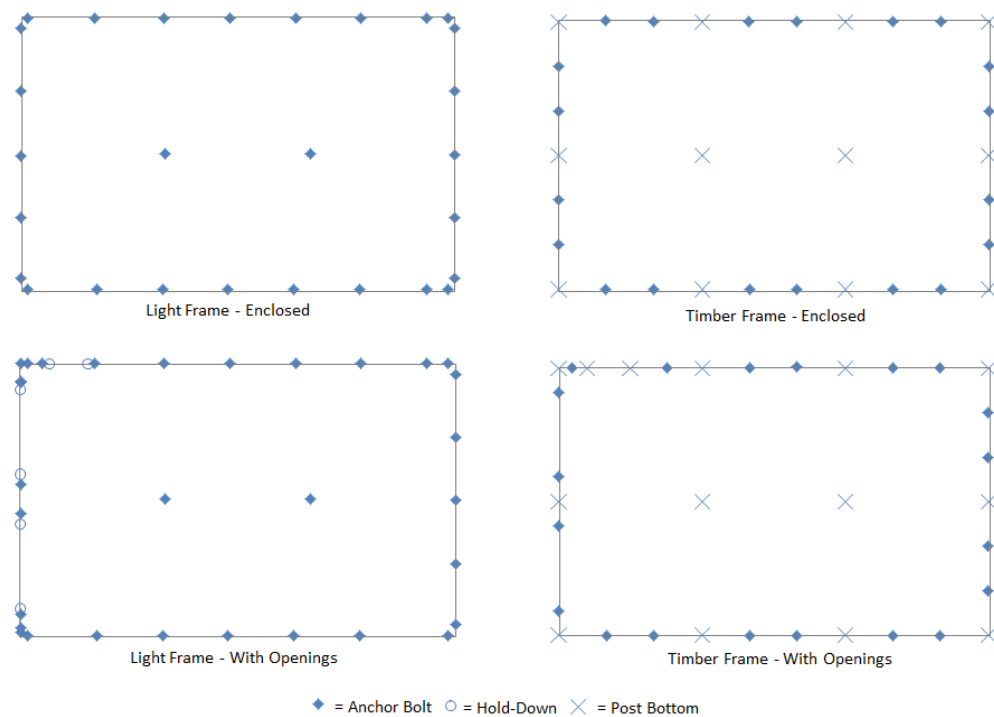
Foundation connection locations for LF and TF structures, enclosed and with openings
